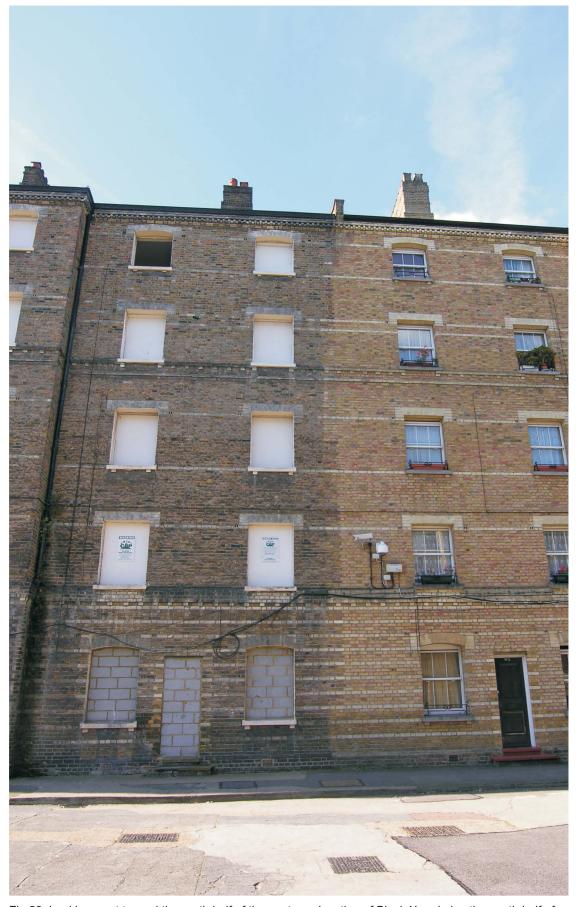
Looking west toward the north half of the eastern elevation of Block X and also the south half of the eastern elevation of Block W (with cleaned brickwork)
